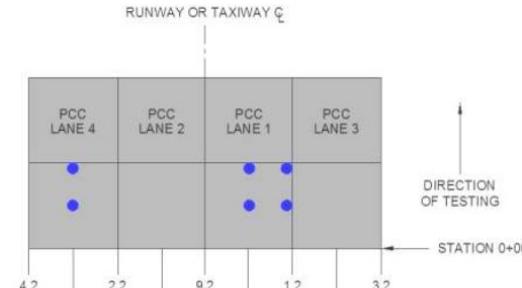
Example Runway or Taxiway Sketch When Centerline Lies on Slab Joint
